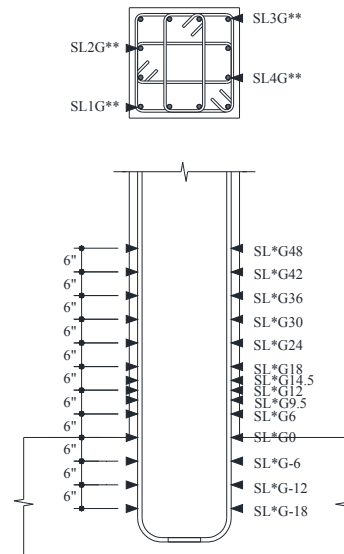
Strain gauges installed on longitudinal reinforcement of both RC and UHP-FRC specimens
